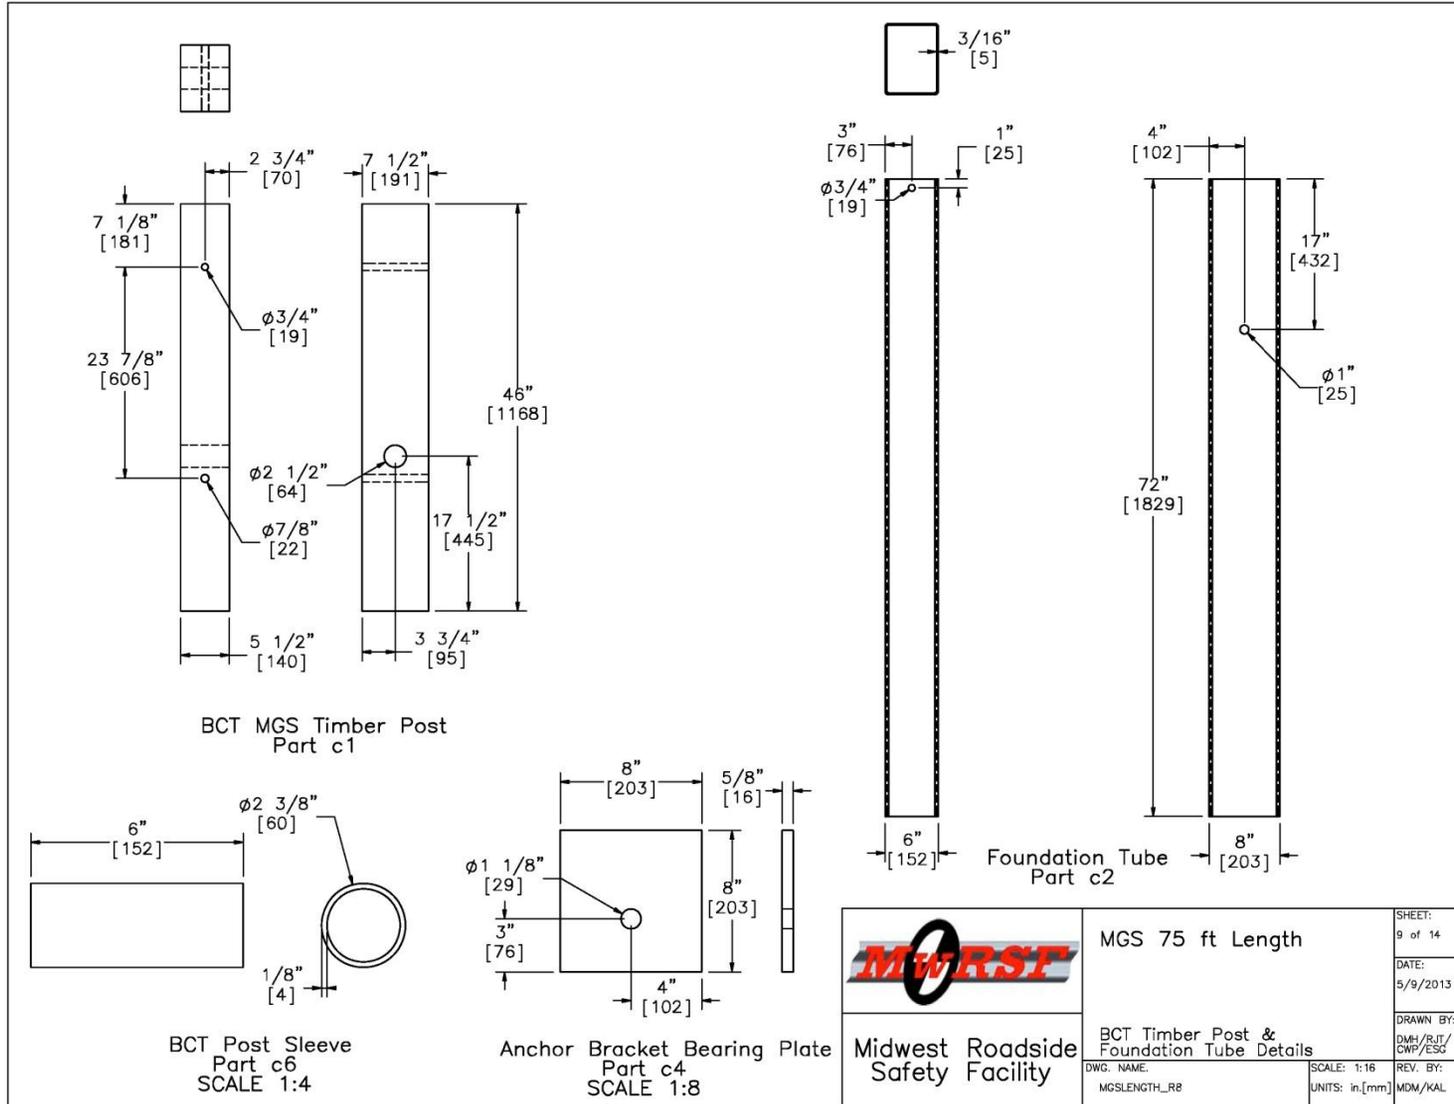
BCT Post and Foundation Tube Details, Test No. MGSMIN-1
